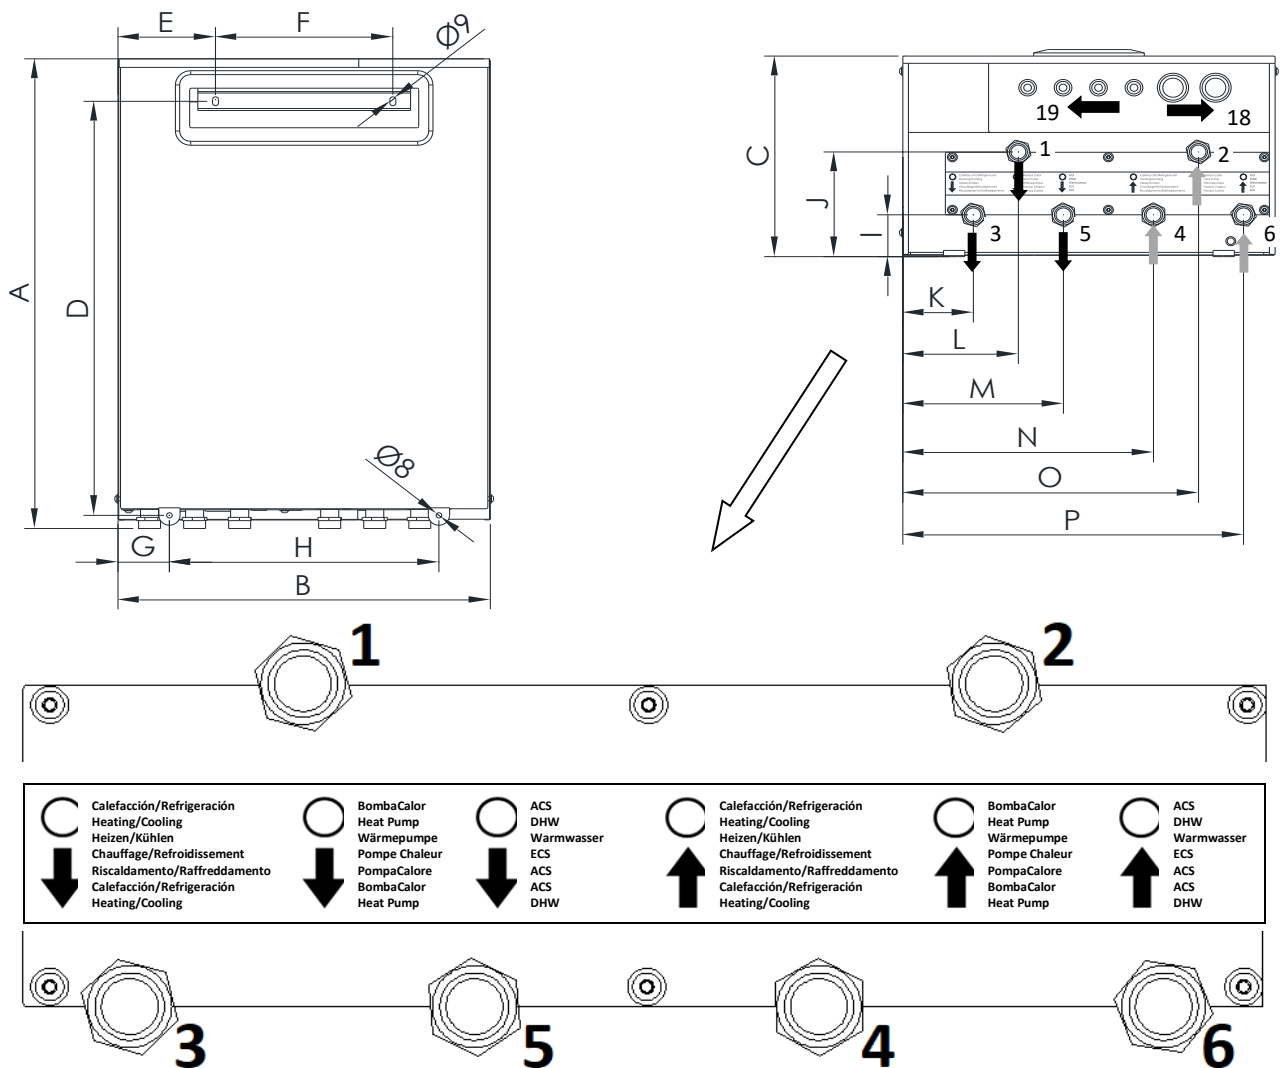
Overall dimensions and hydraulic connections of Hidrokit indoor units (Dimensions in mm).
